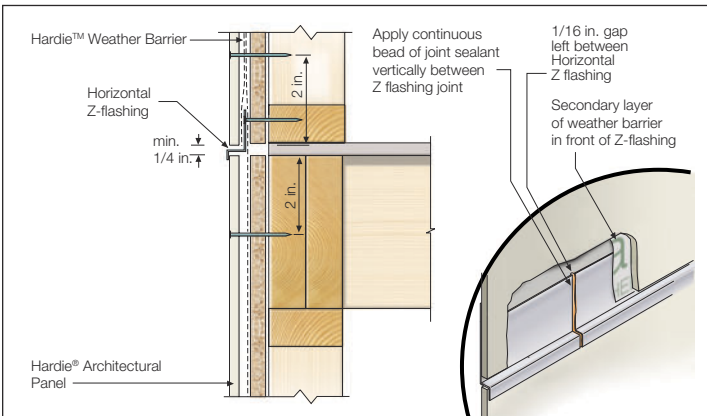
Upper Floor Junction Option 2 - Z Flashing
